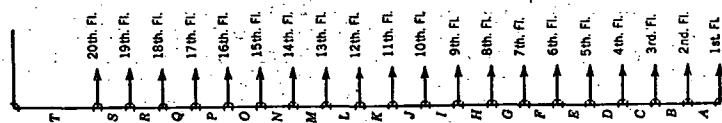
TYPICAL RISER FOR 20-STORY BUILDING
